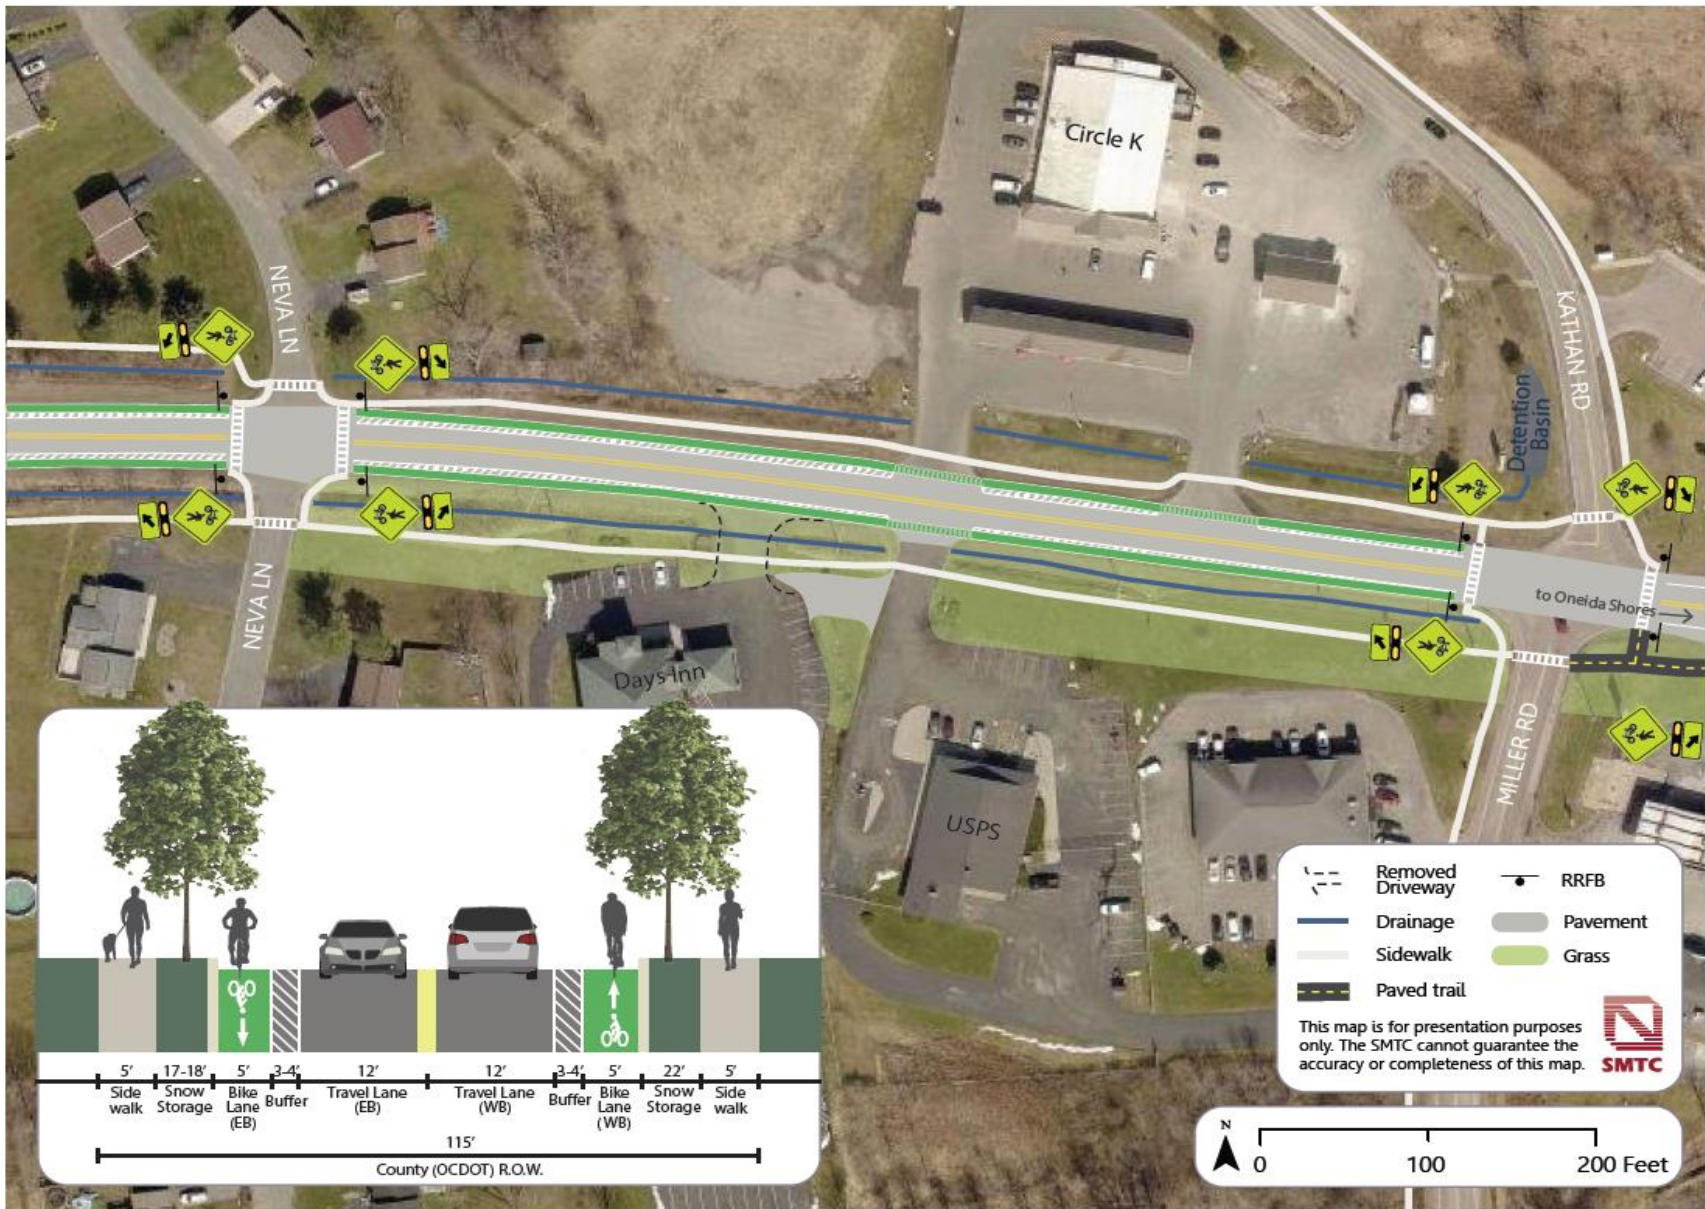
Envisioned Conditions: Bartell Road (Neva Lane to Miller Road/Kathan Road)
